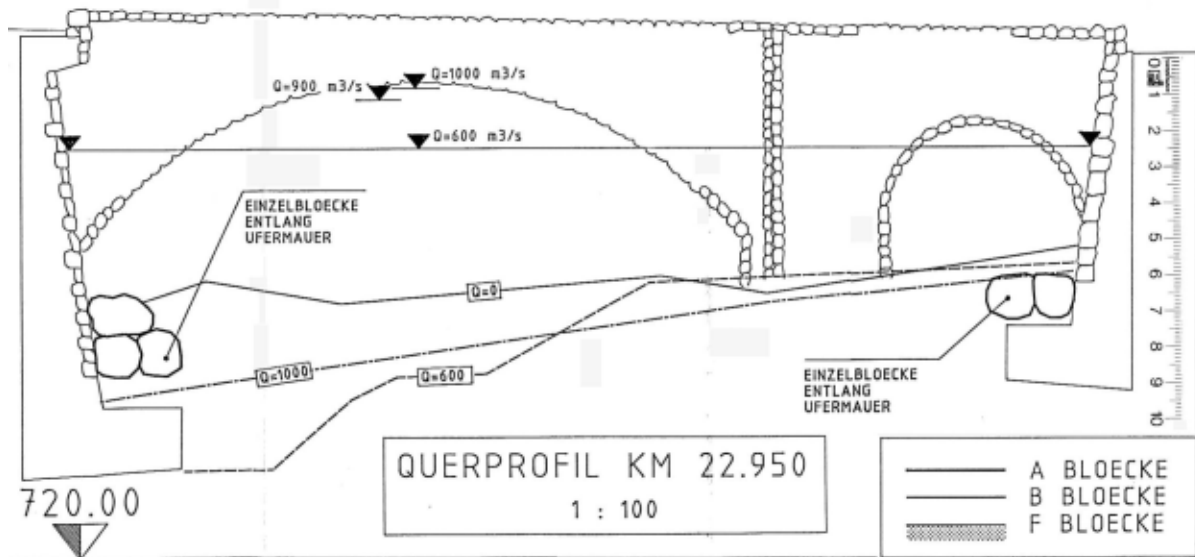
Cross section in the scour hole, upstream the bridge [Kuster et al., 1992, Appendix F, Plan 22]
